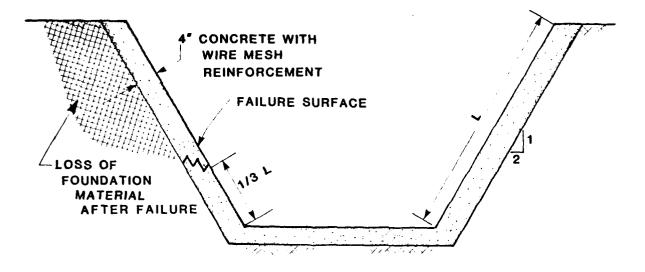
Typical failure of concrete trapezoidal channel as described by Metropolitan St. Louis Sewer District.
